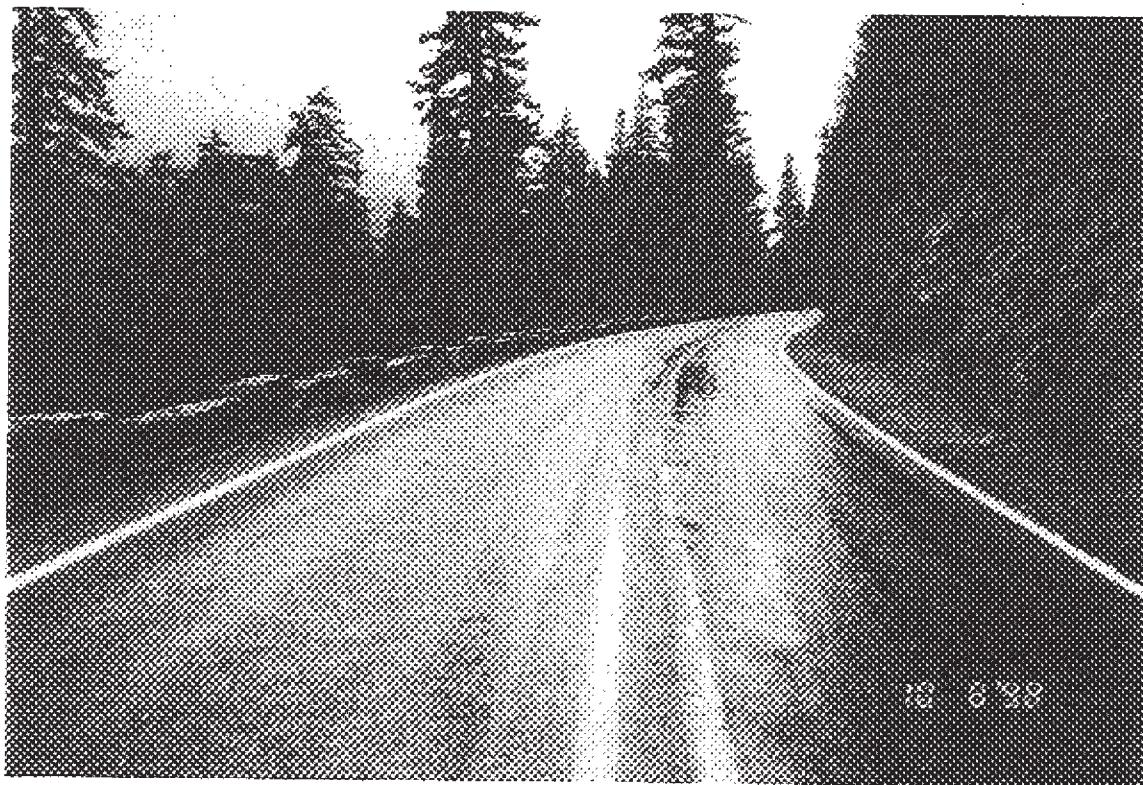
MP 7.70 - Typical pavement section and rock wall
